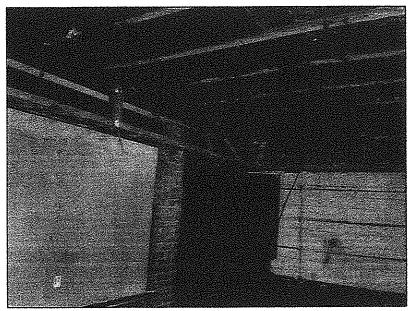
View of burnt framing at rear elevation and damaged joists inside.
